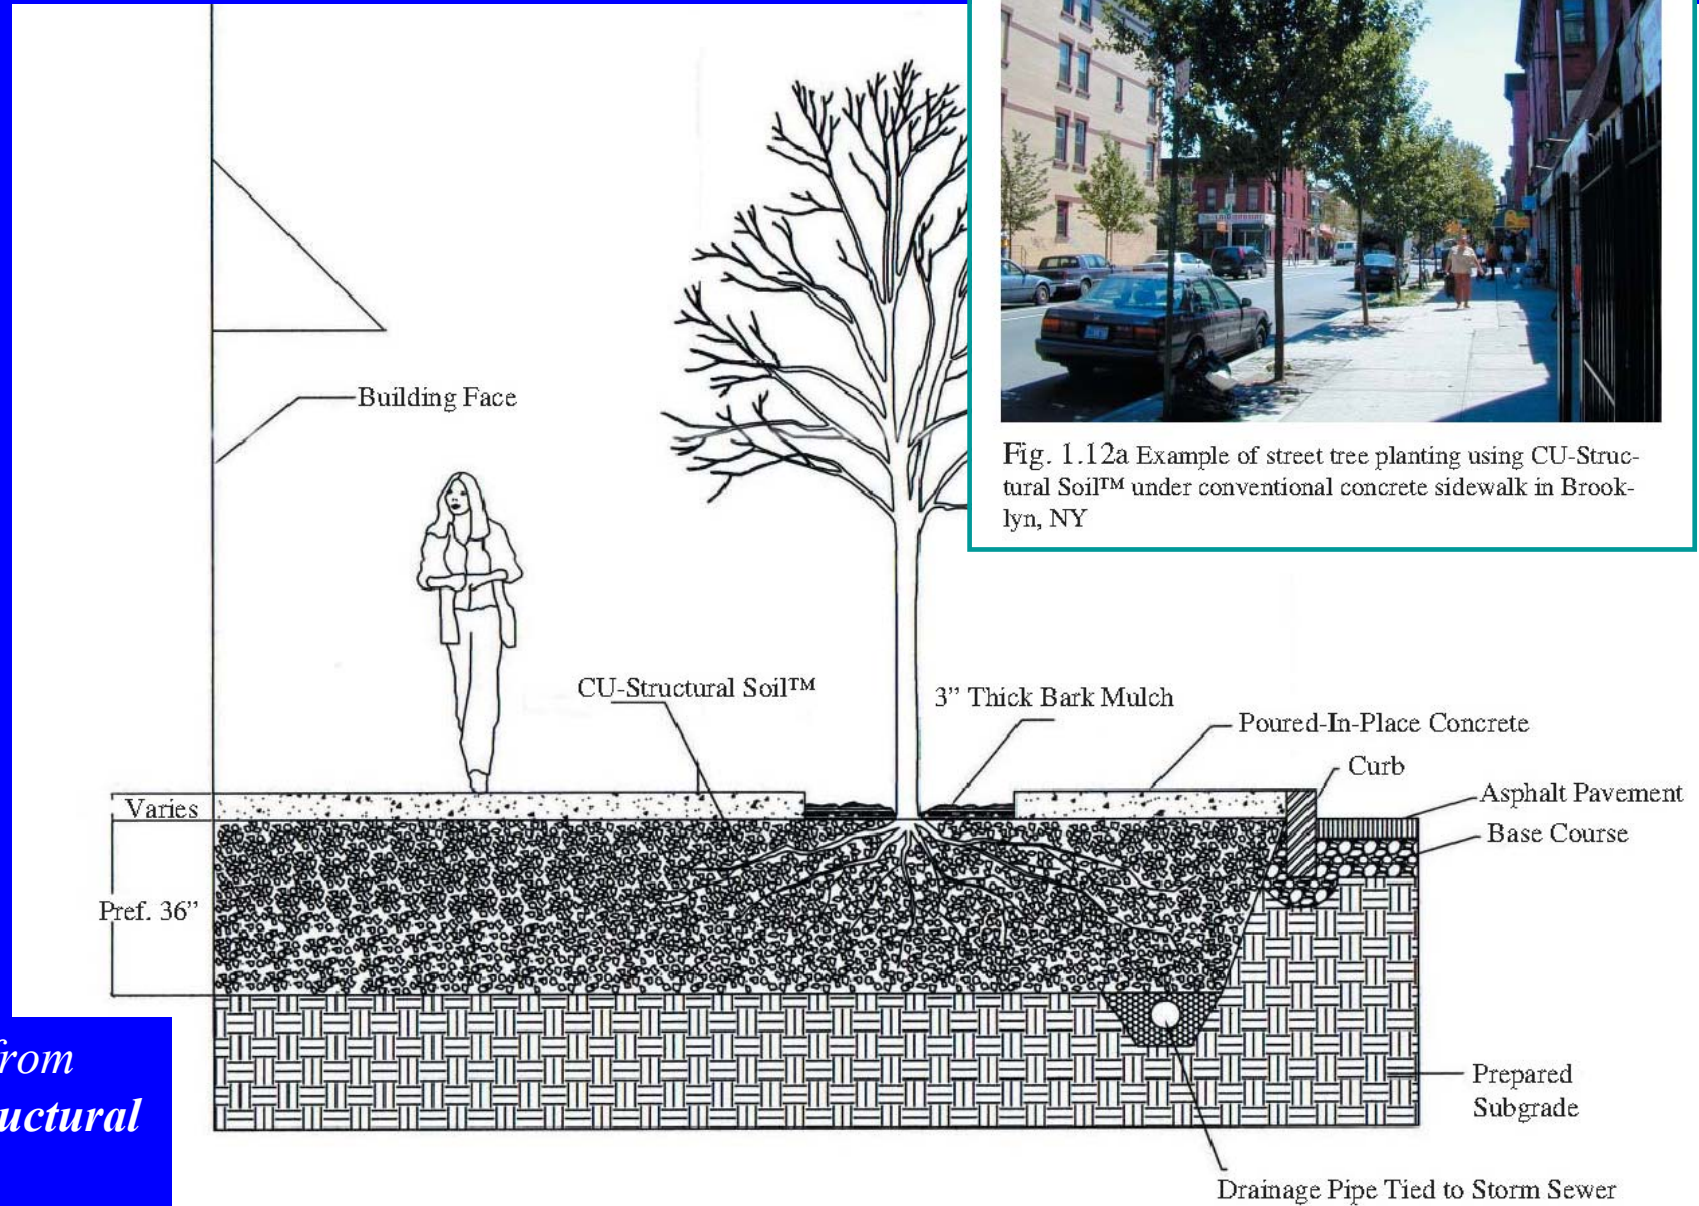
Example of street tree planting using CU-Structural Soil™ under conventional concrete sidewalk in Brooklyn, NY
